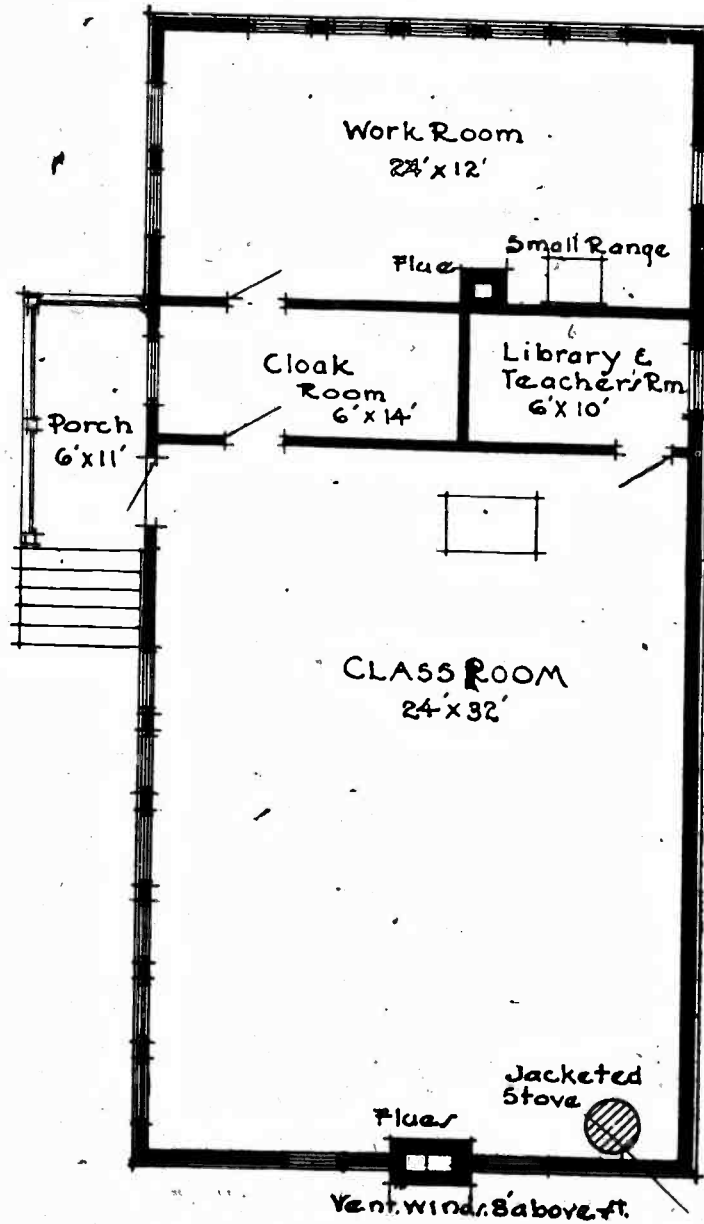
Rearranged floor plan of building shown in fig. 11.
